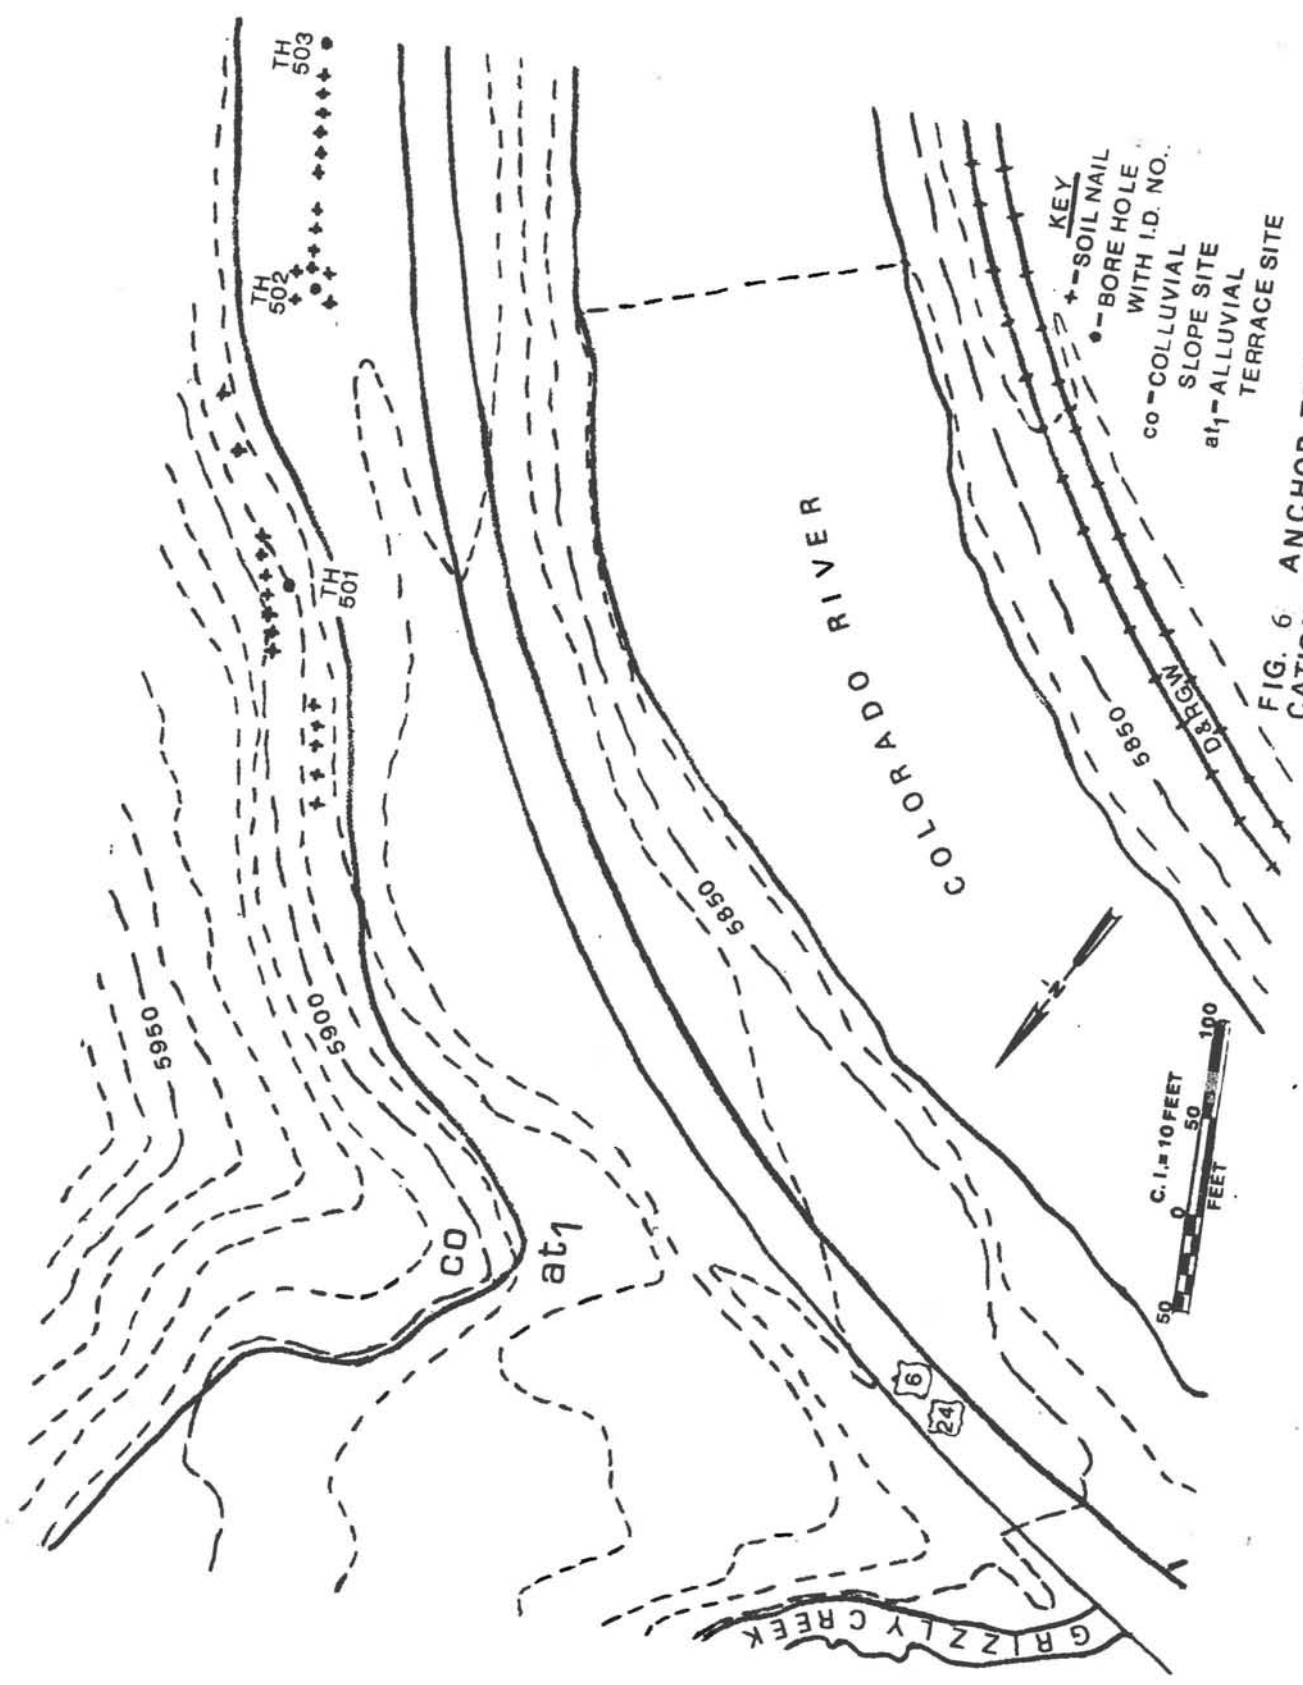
ANCHOR TEST SITE LOCATION WITH TOPOGRAPHY.
